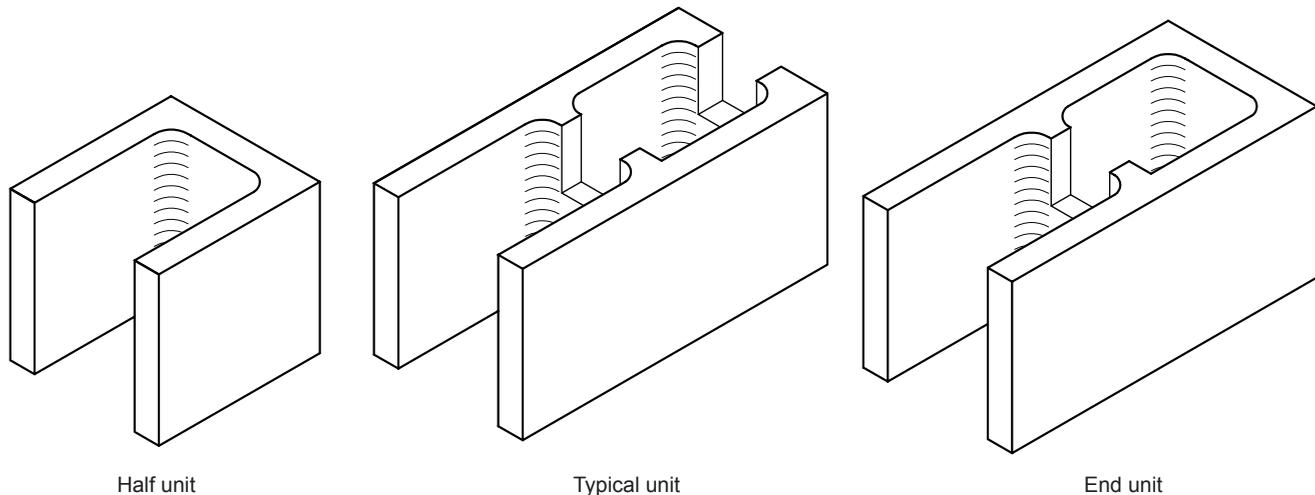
Grout flow is facilitated in a fully grouted wall with open-end masonry units.
